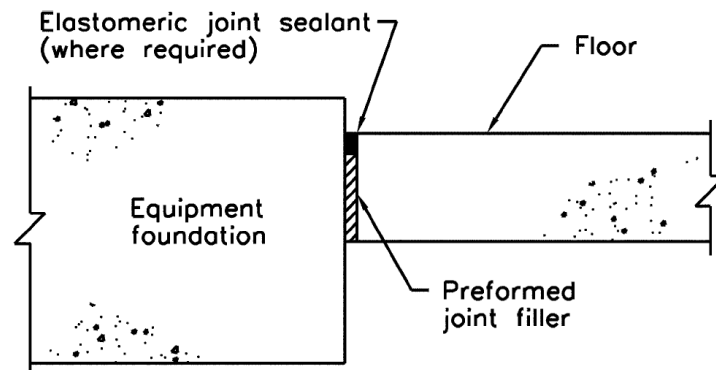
Typical Expansion/Isolation Joint (ACI 302 2004)
